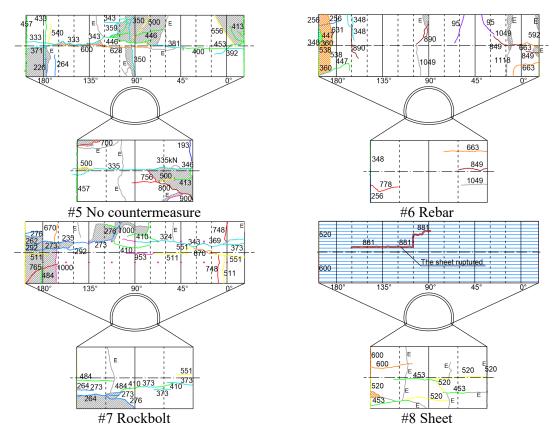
Cracking and failure status of the lining model (Horizontal load direction).
